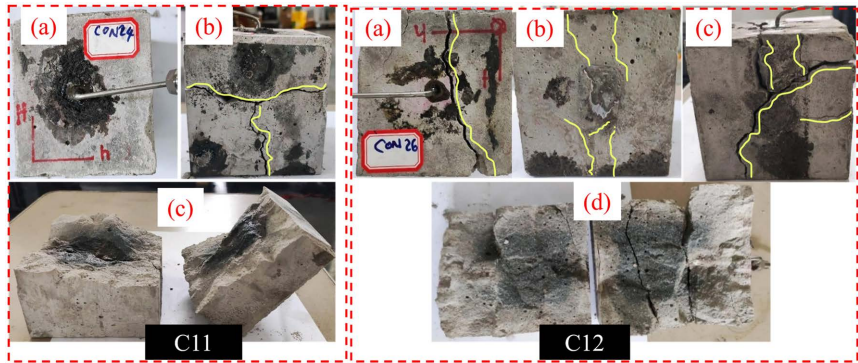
Tested samples C11 (a) HF direction, (b) HF development, (c) fracture surface; C12 (a) HF direction, (b) multiple HF development, (c) fracture development, (d) fracture surface.
